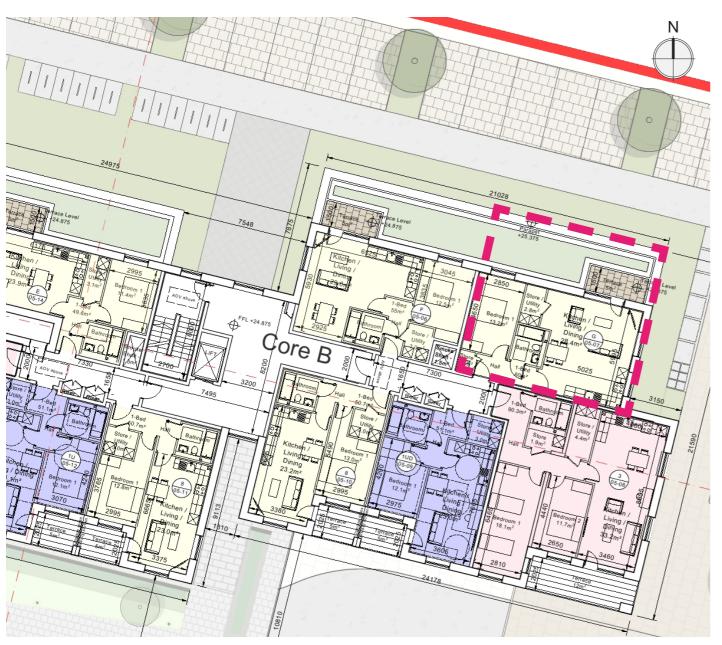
Block 6 Fifth Floor Key Plan with Unit 06-05-07 highlighted
